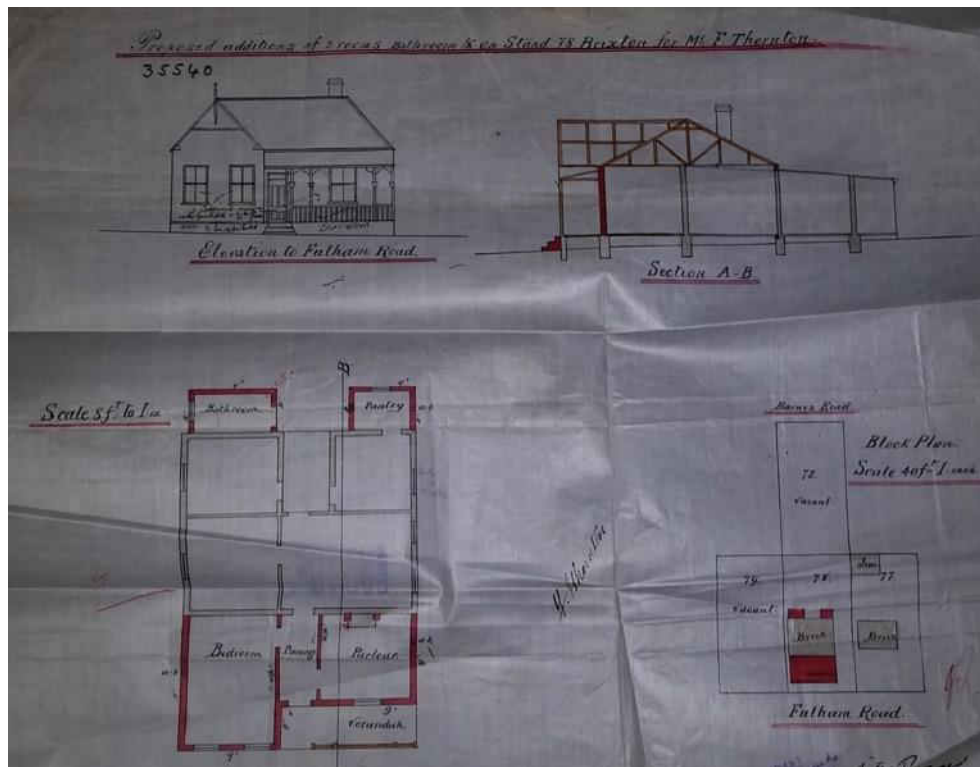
Plan for freestanding house close to street edge with corrugated iron roof, side stoep and central doorway
